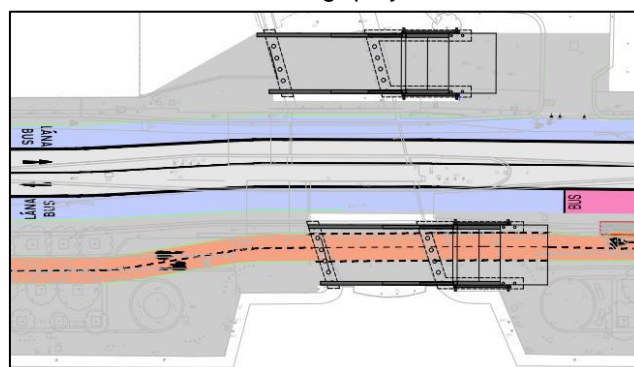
Proposed relocation of Scherzer Bridges and new bridge at Area A (George's Dock).
